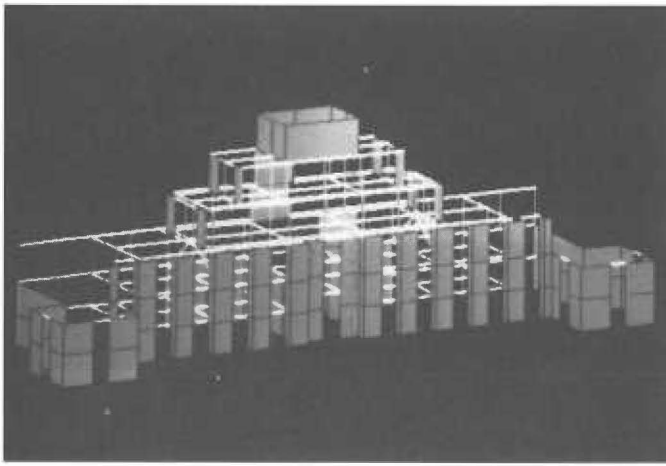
Finite element analysis of the administration building. (Courtesy of Meyers, Nelson, Houghton)
